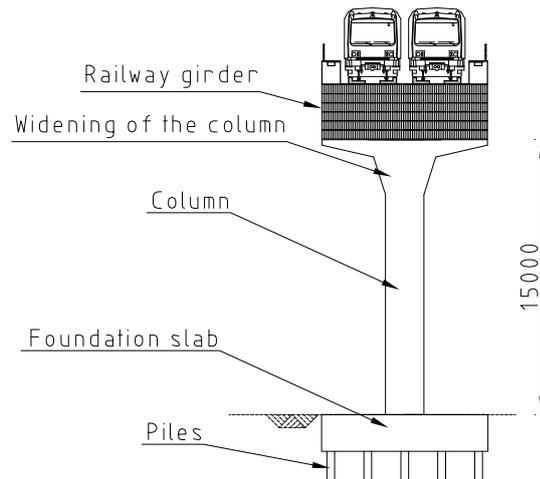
Schematisation of the elevated metro structure with a FRP sandwich girder
